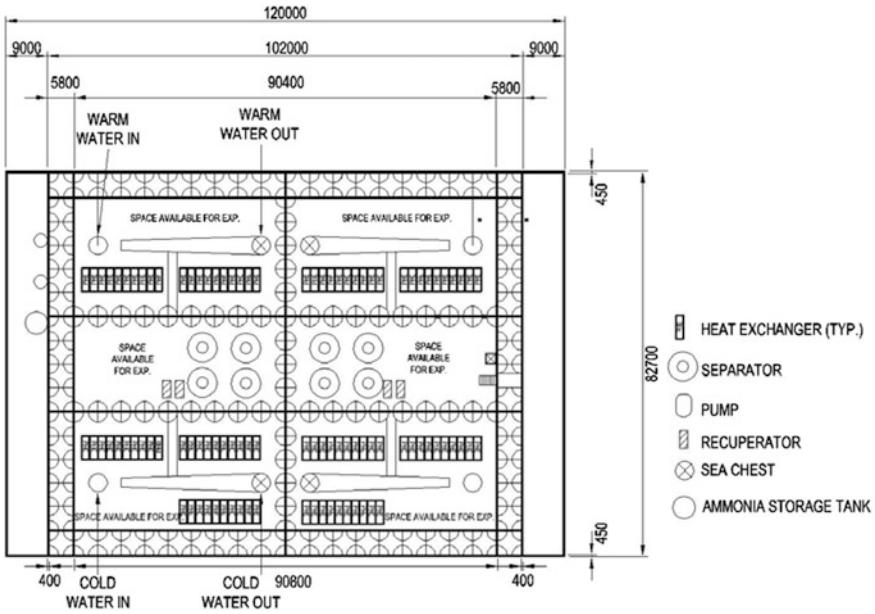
Plan view of level compartment for 20 MW OTEC plantship
